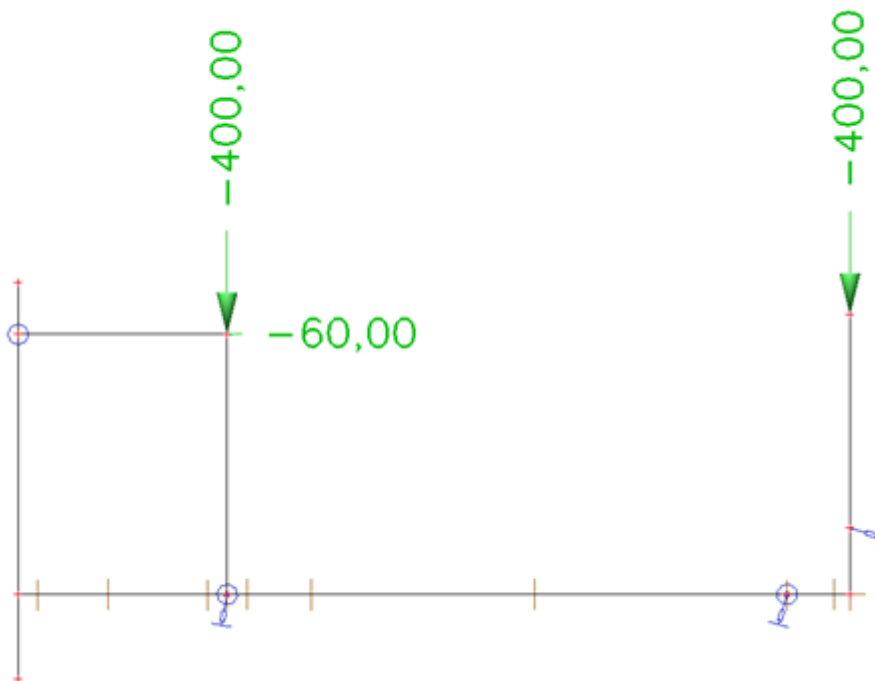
2D model: LC7-4- Crane load (waterside rail towards water)
